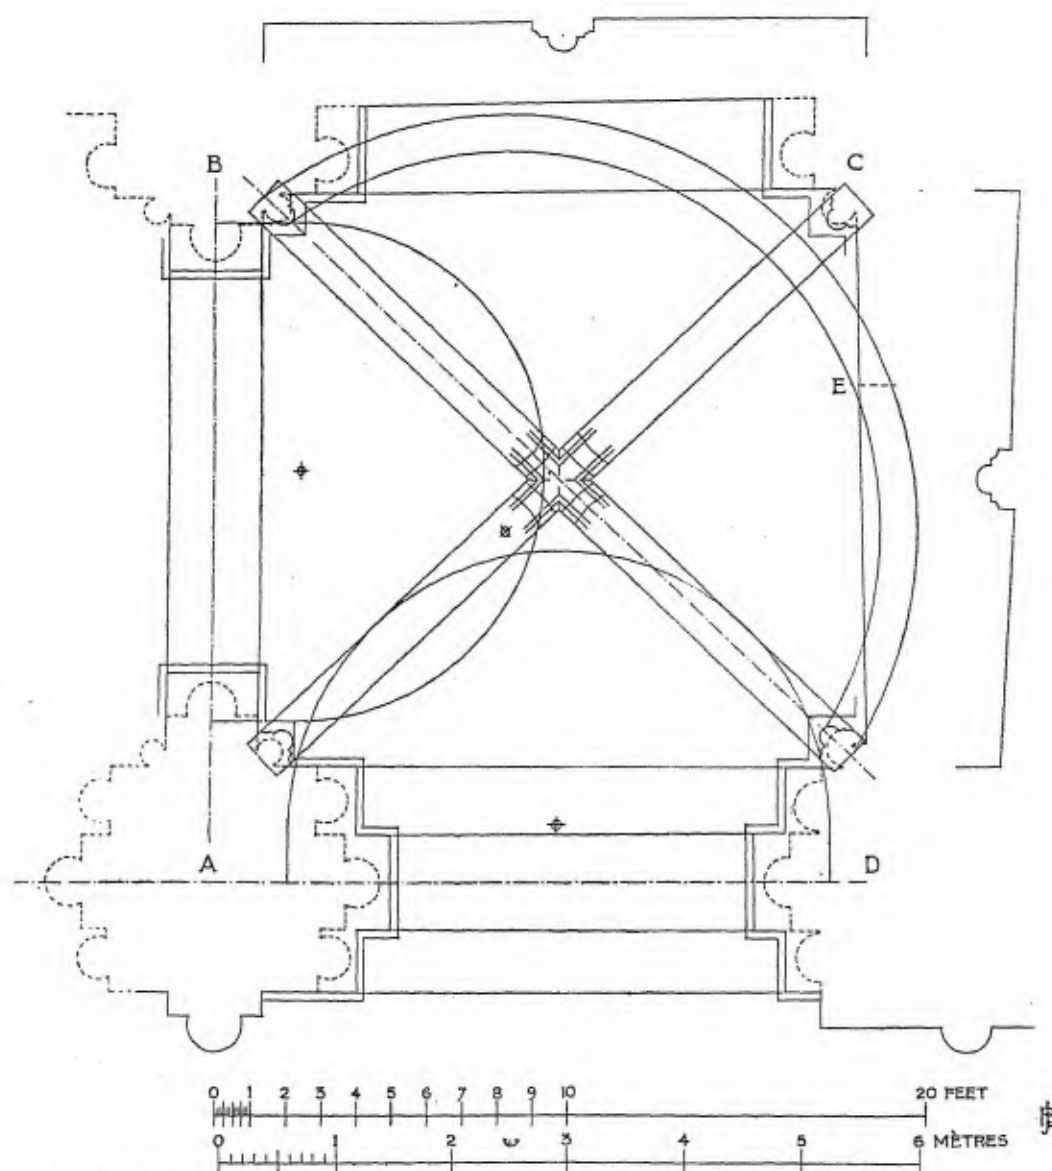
WINCHESTER, EAST AISLE OF NORTH TRANSEPT, THIRD BAY FROM NORTH: PLAN OF VAULT.
